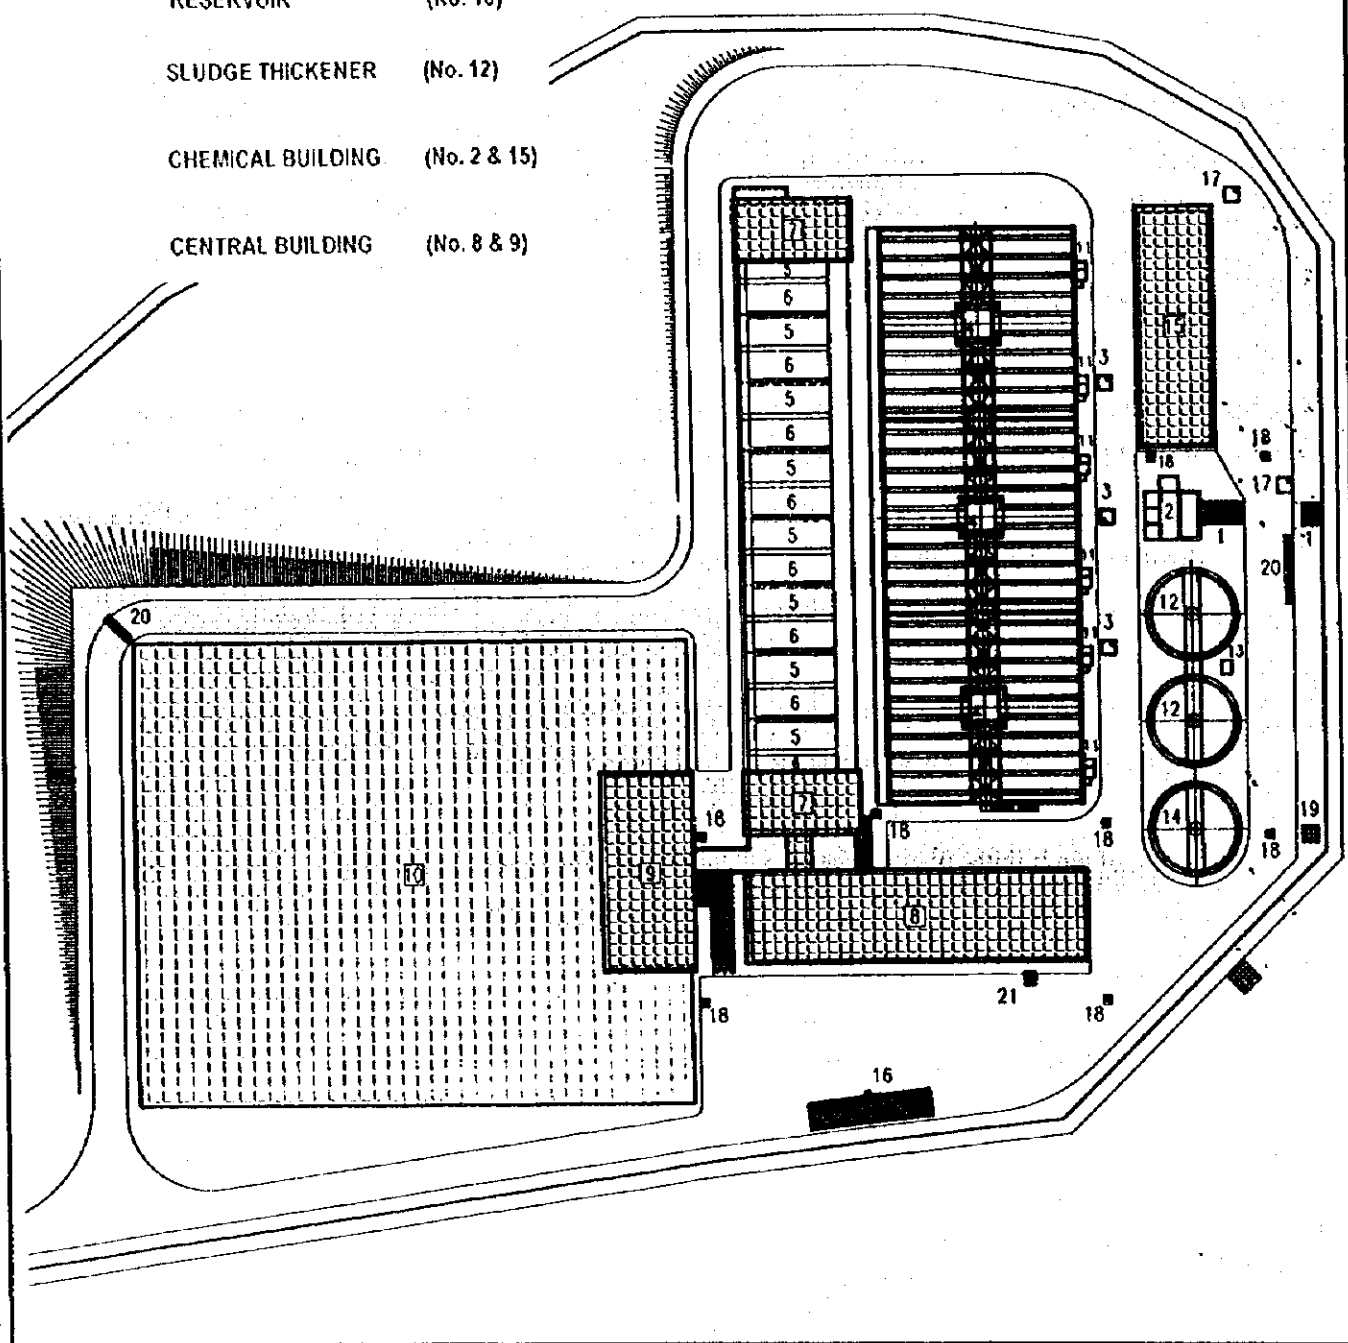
Layout of the Bovilla Water Treatment Plant
